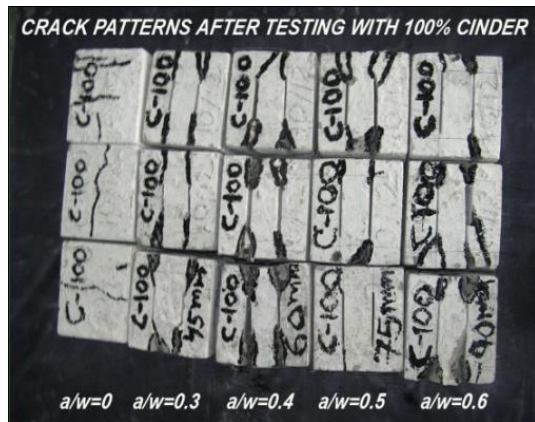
VIEW SHOWS THE CRACK PATTERNS AFTER TESTING OF C-100 SPECIMENS
